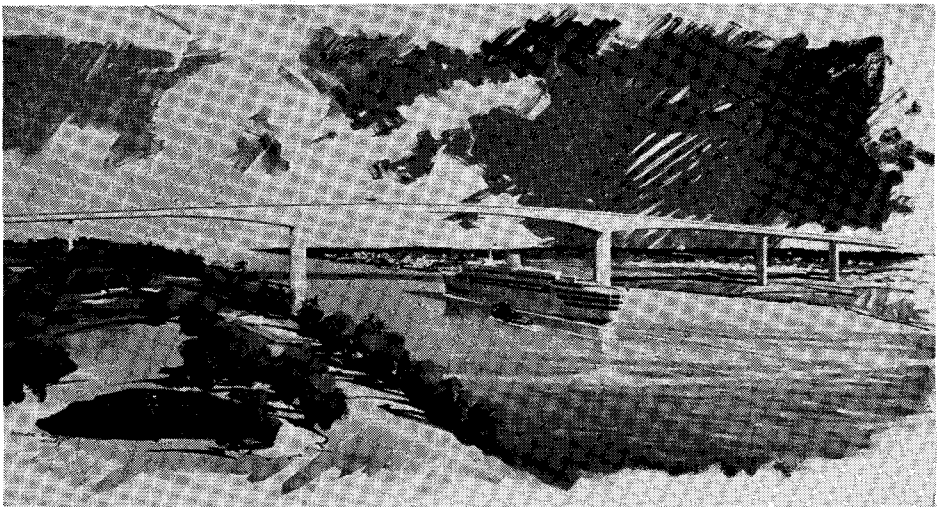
Gateway Bridge, Australia, river span 852.2 ft (260 m).
